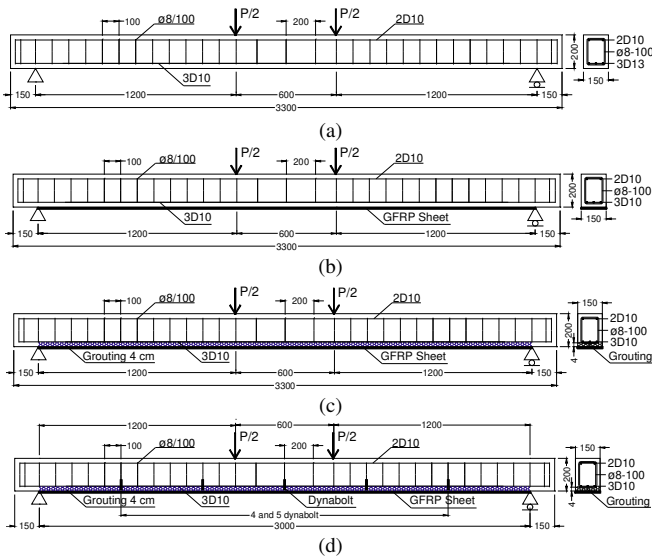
Fig. 3 Detail specimens (a) control beam (BK), (b) beam with GFRP sheet (BNS), (c) beam composite grouting and GFRP sheet (BGS), (d) beam composite grouting, dyna-bolt anchors and GFRP sheet (BGSD4,5)
